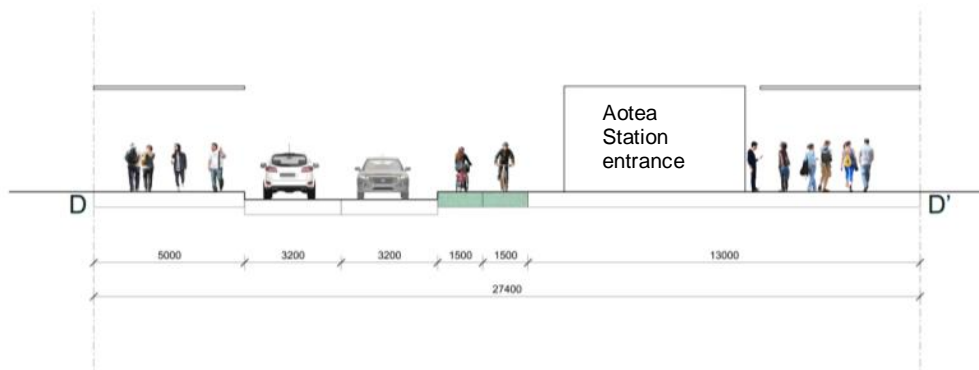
Victoria Street typical cross section: Albert to Elliott (option 1B/D)
